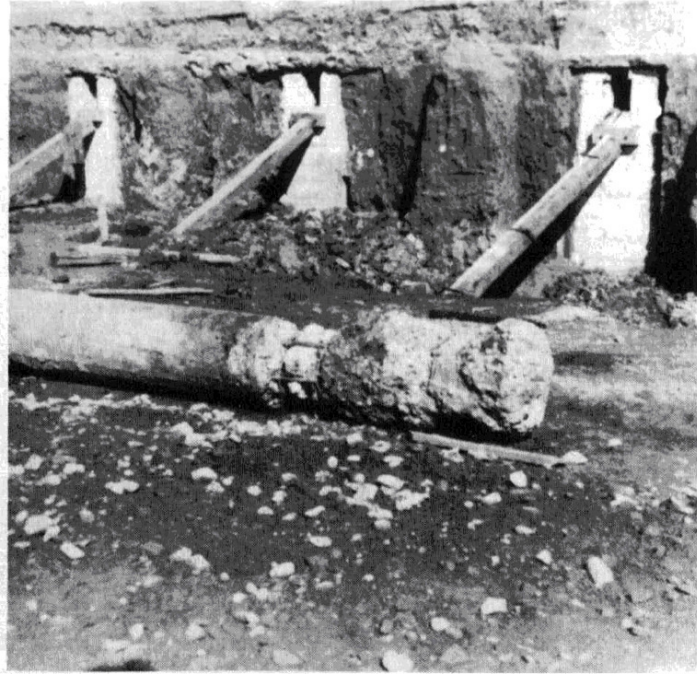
Toe of pile after concreting with water in bore. (Flaming, 1992)
